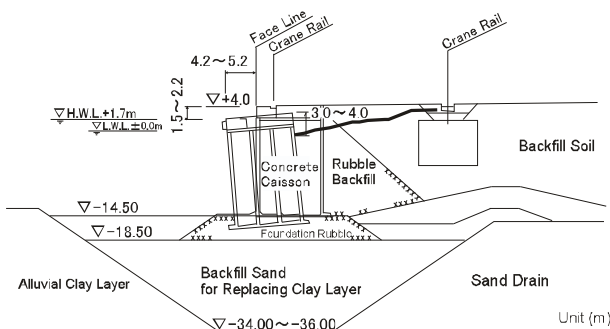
Cross section of gravity quay wall at Kobe port and deformation/failure during 1995 Great Hanshin earthquake, Japan
